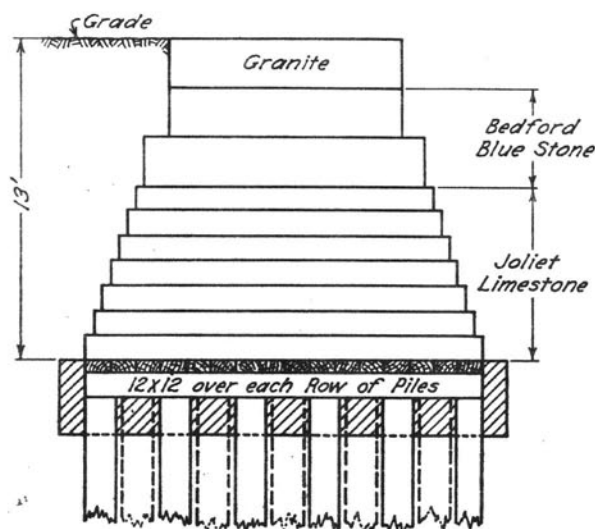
PILE FOOTING OF ILLINOIS CENTRAL STATION
